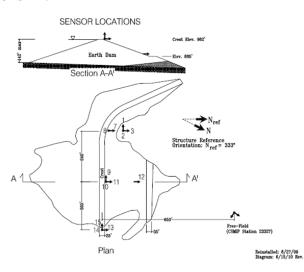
Typical cross section and plan view of earth dam instrumented with accelerometers [20].
